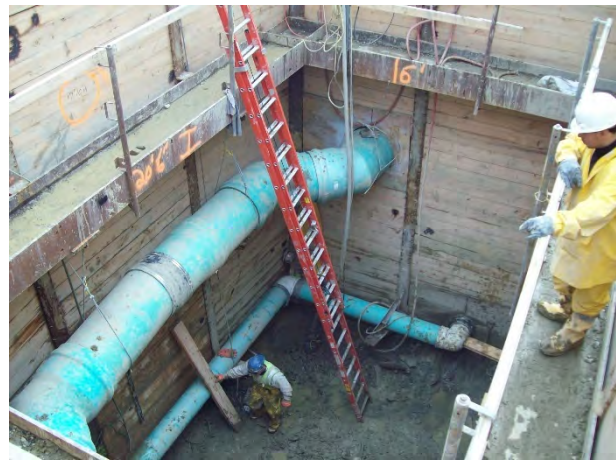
Example of Tunneling Pit (for trenchless construction)
